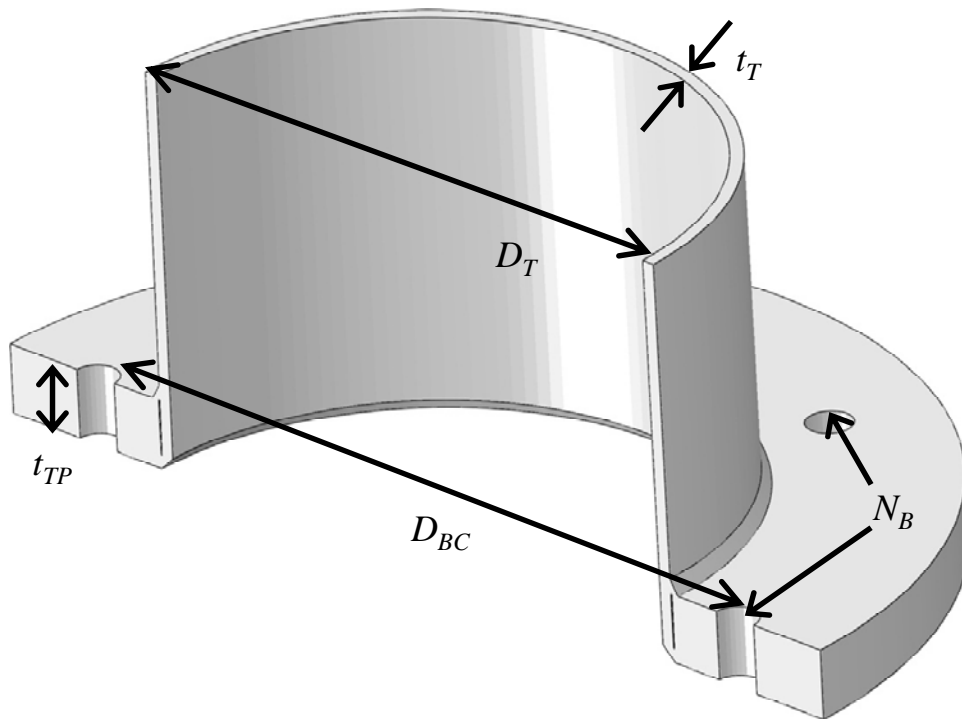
Geometric parameters for unstiffened fillet-welded tube-to-transverse plate connection
